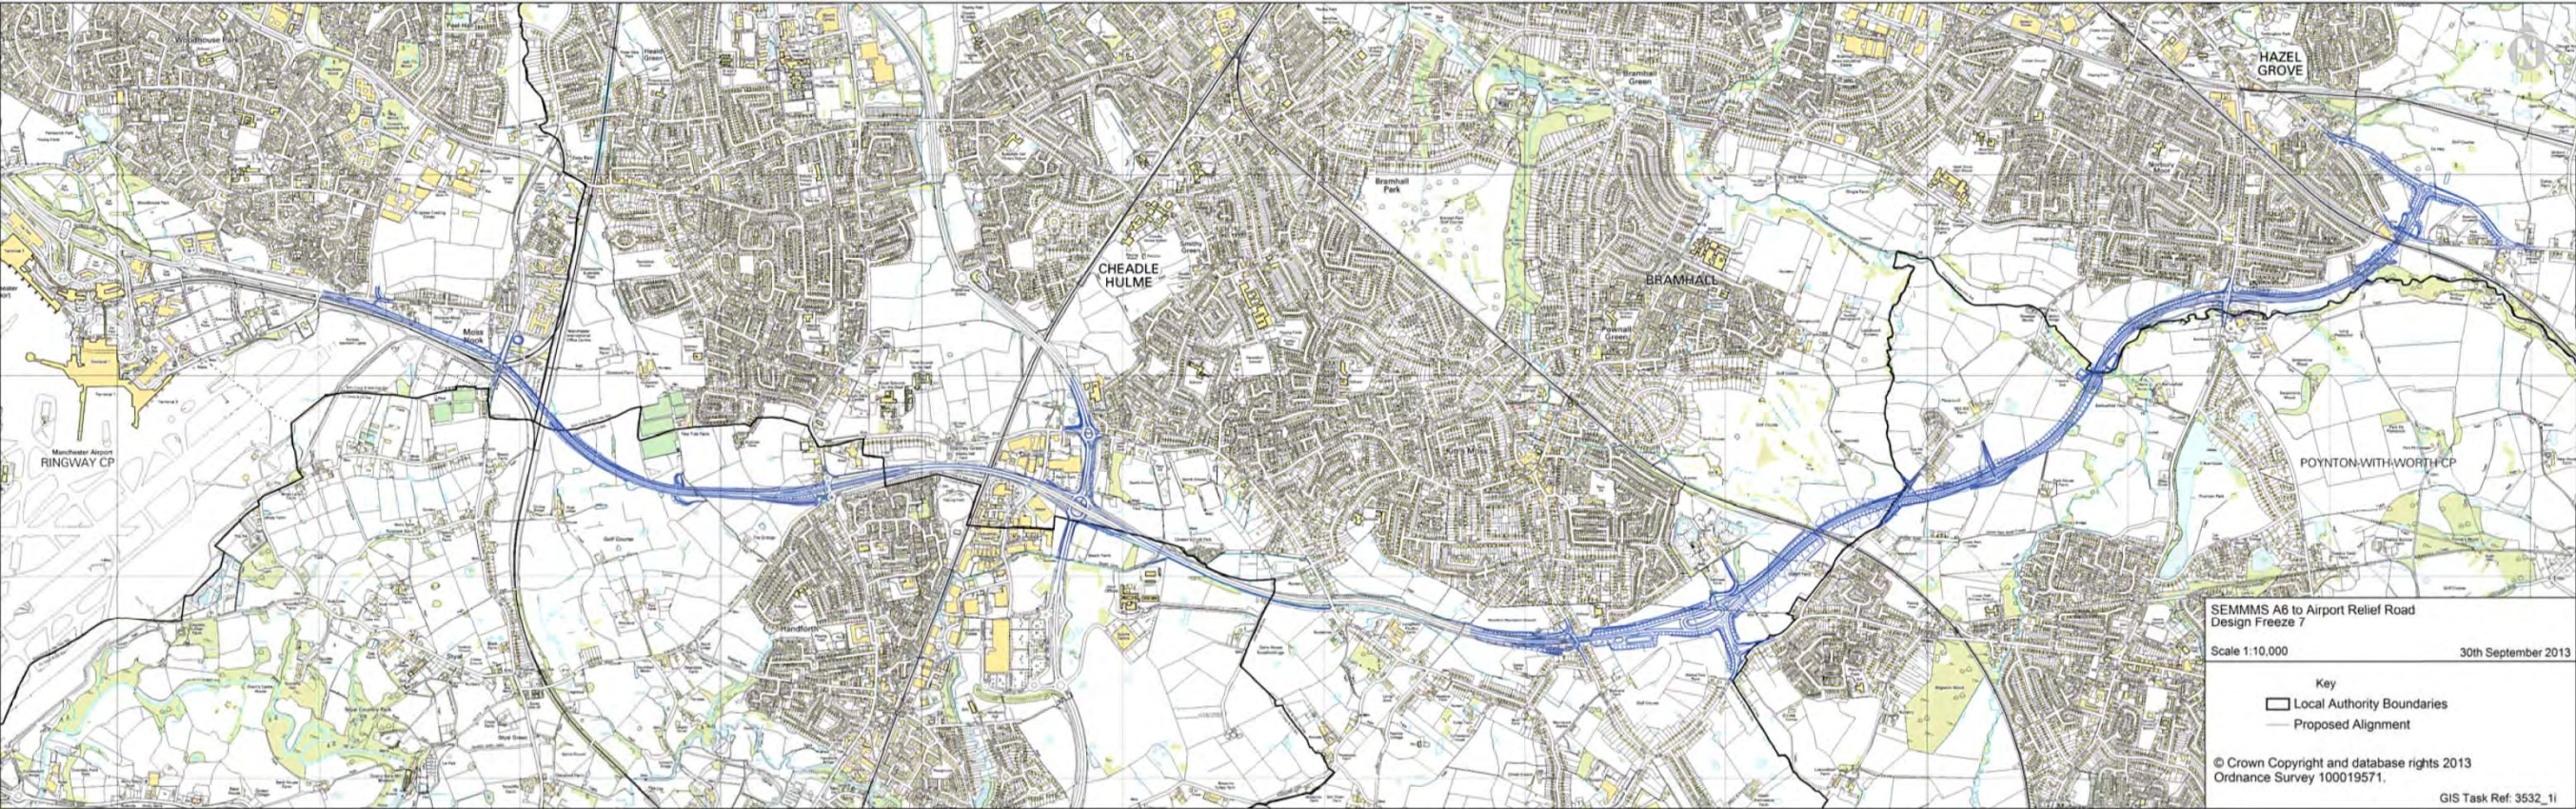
Proposed Highway Route: Wythenshawe (Ringway Road/ Shadowmoss Road)
